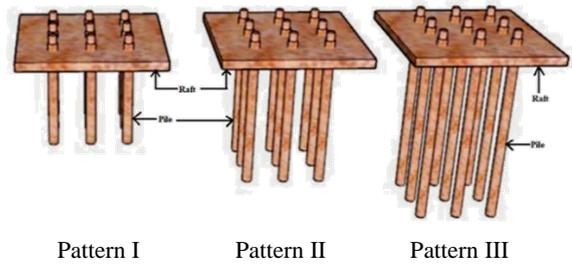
Pile arrangement configuration of 160 mm x 160 mm piled raft
